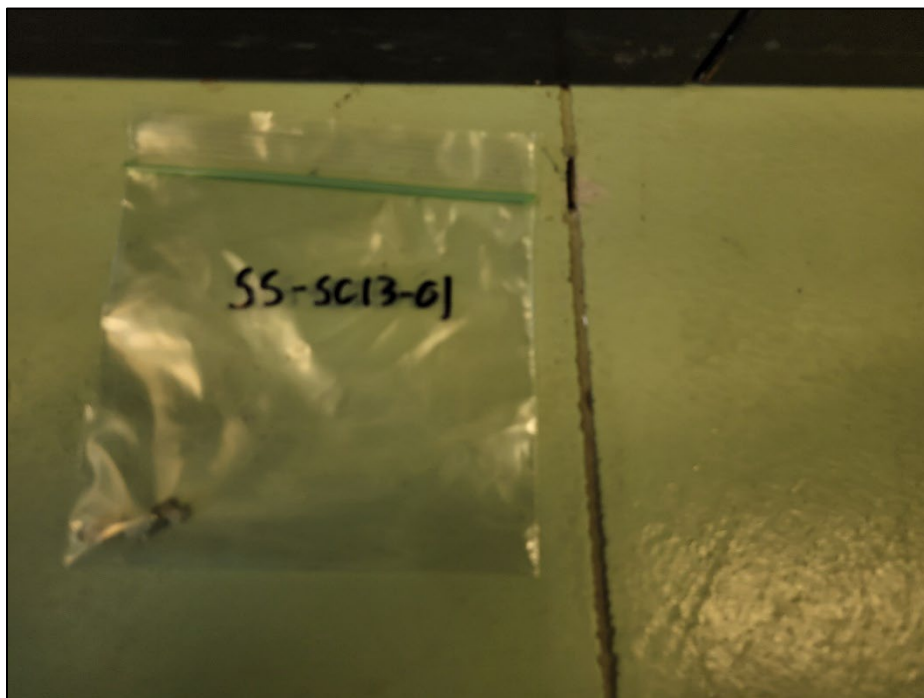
SC13: Silicone in kitchen / staff break room flooring
